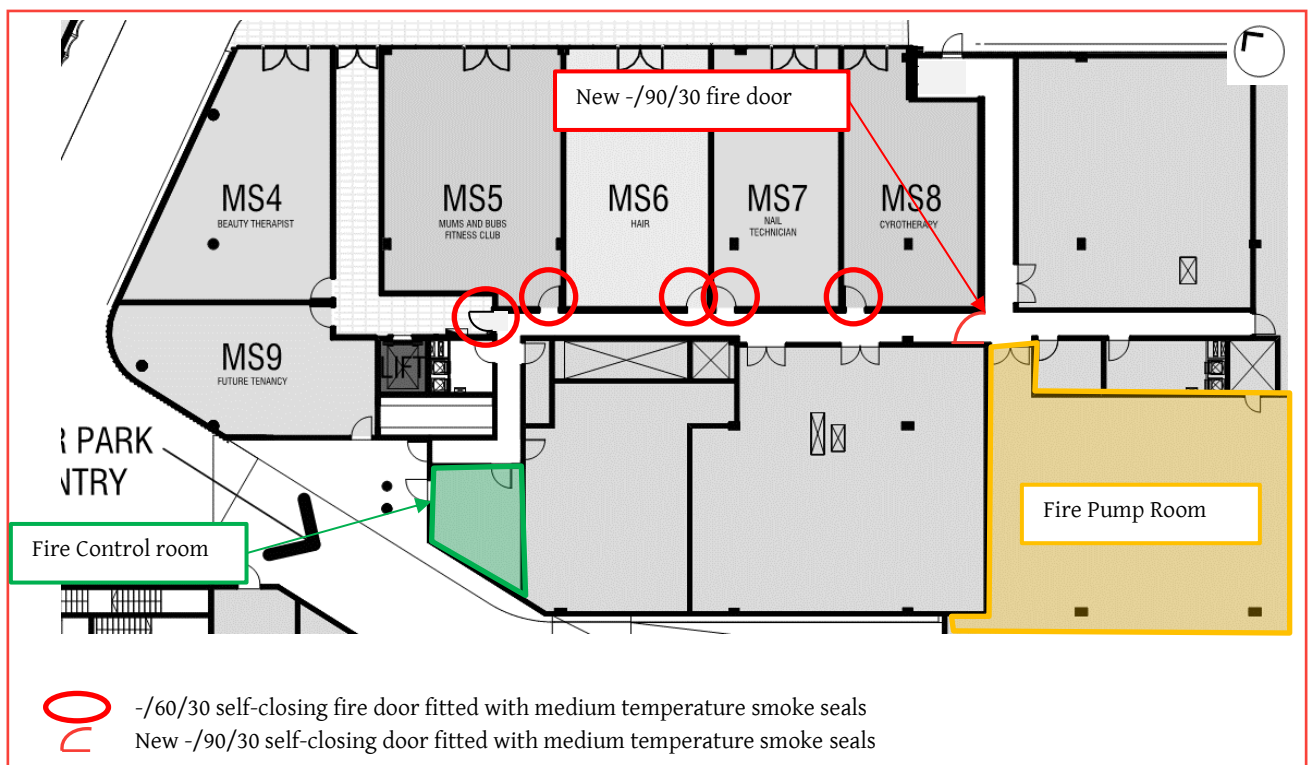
Access doors opening into the fire-isolated corridor on Lower Ground Floor
